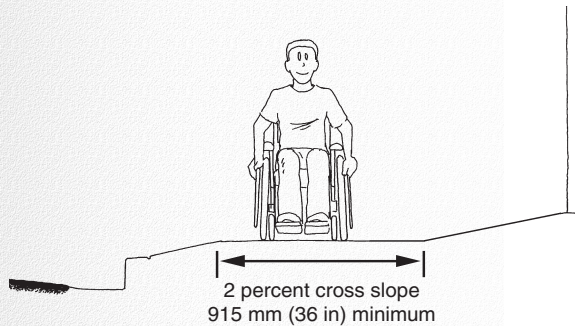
GOOD DESIGN: A level area at least 915 mm (36 in) wide improves access when the street elevation is lower than the building elevation.
